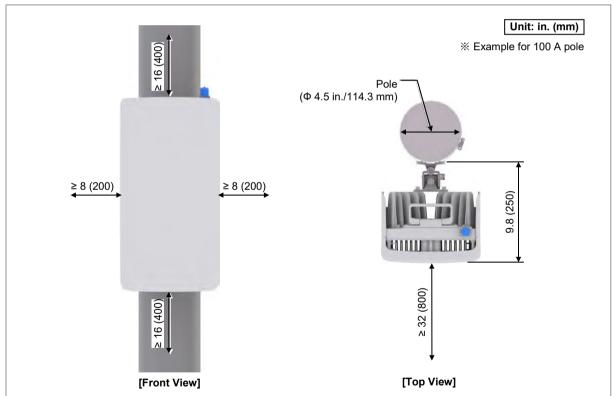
AU Arrangement_2 Sector Pole Type Installation
